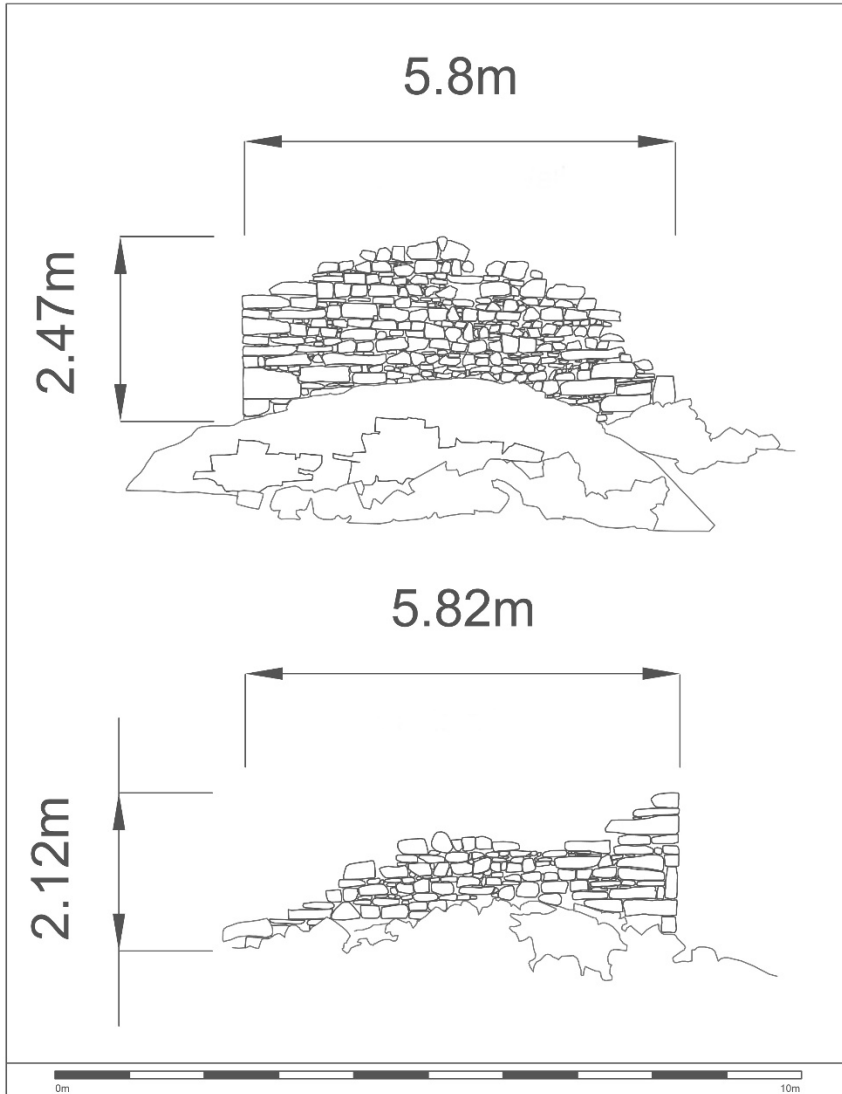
External elevations of the north (top) and east (bottom) walls of the signal tower at Glinsk Signal Station.
